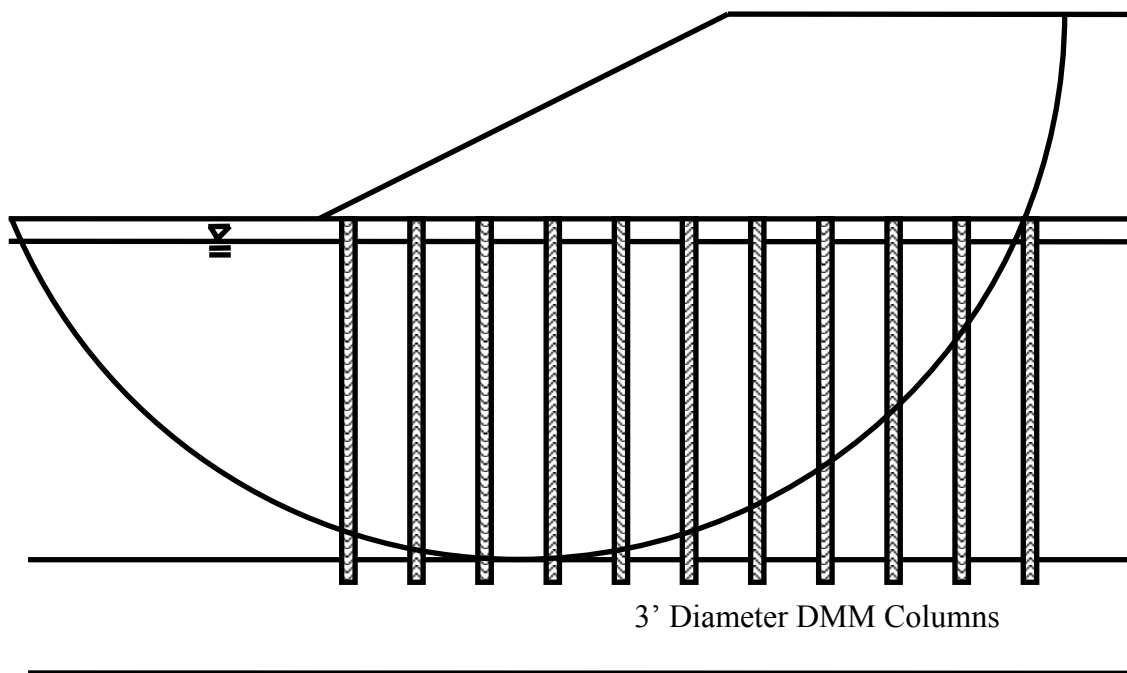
Shear failure through columns and soil in the foundation
